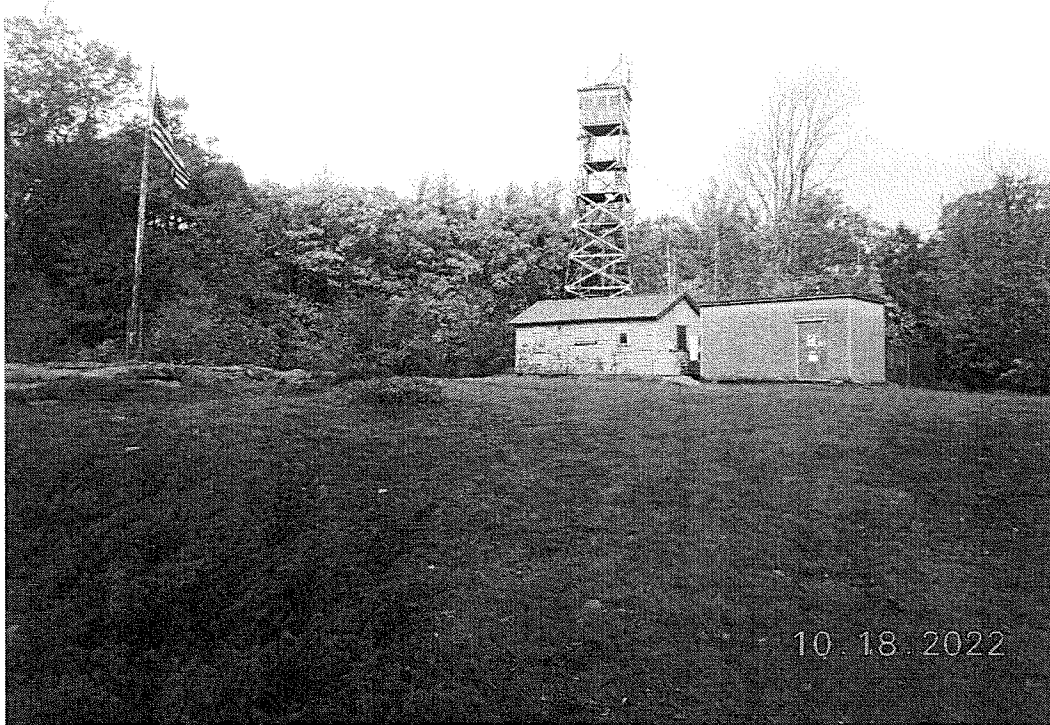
View north from the proposed tower site toward the existing fire tower, watchman's cabin and flagpole. The equipment cabinet located to the right of the watchman's cabin would be removed and all USCC equipment (including antennas) would be located within the new fenced tower compound.
